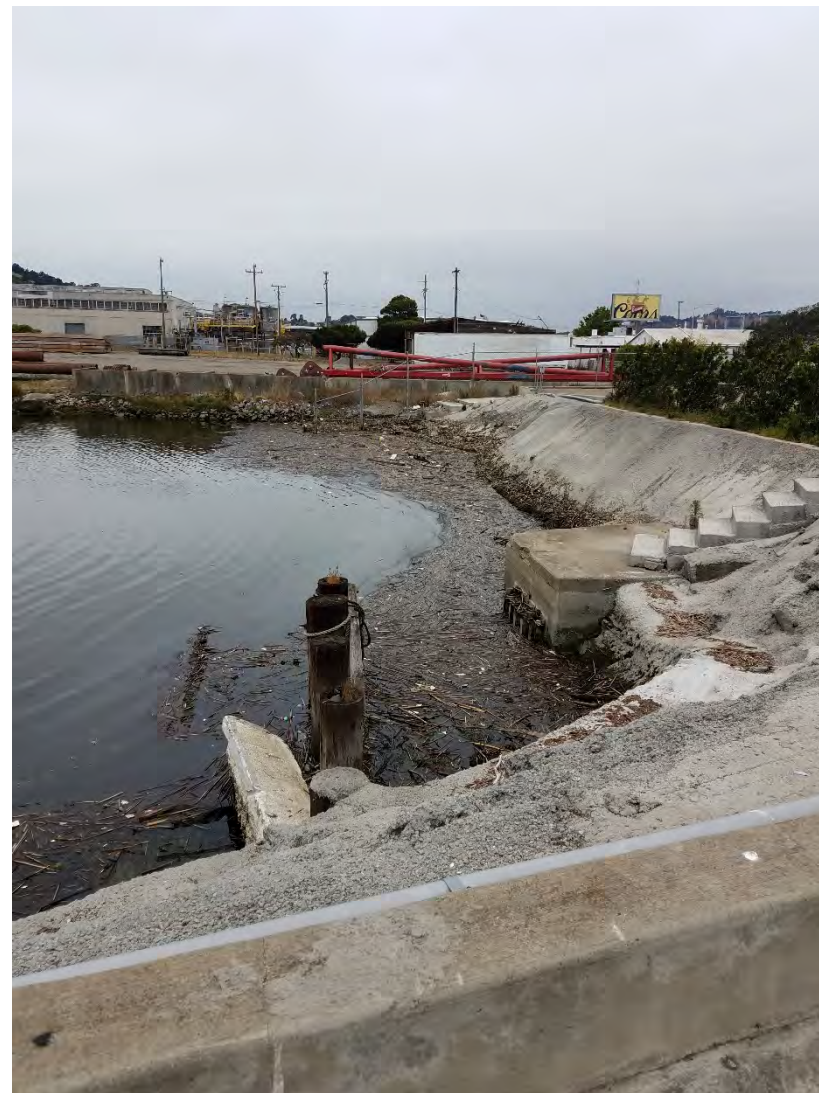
Looking west toward municipal outfall: shotcrete along northern shoreline.
